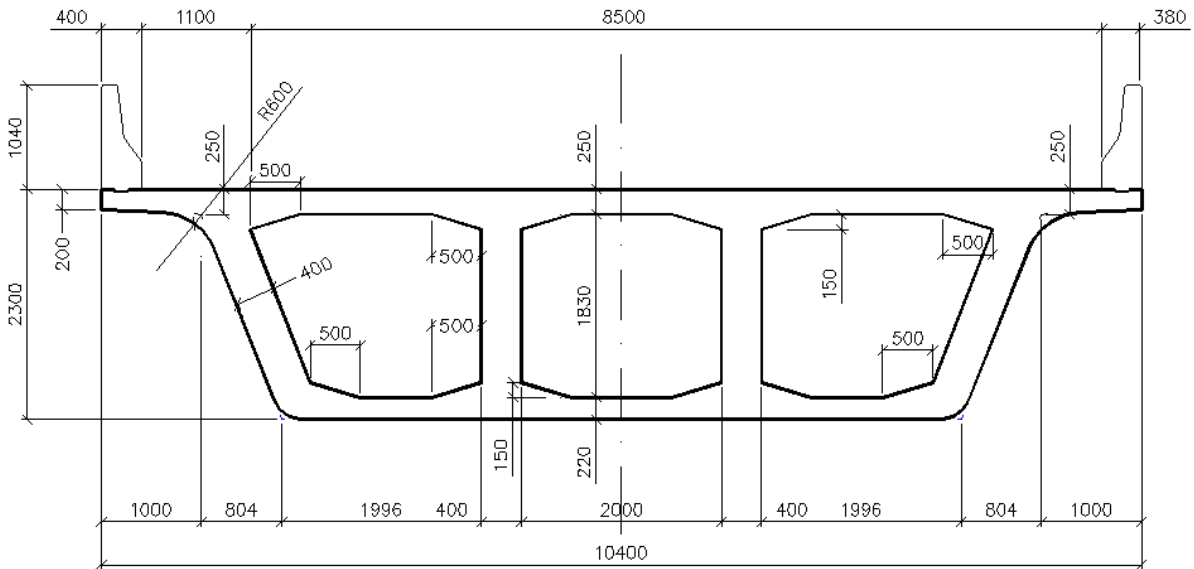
RC Bridge. Geometry of the section of the deck (dimensions in mm).
